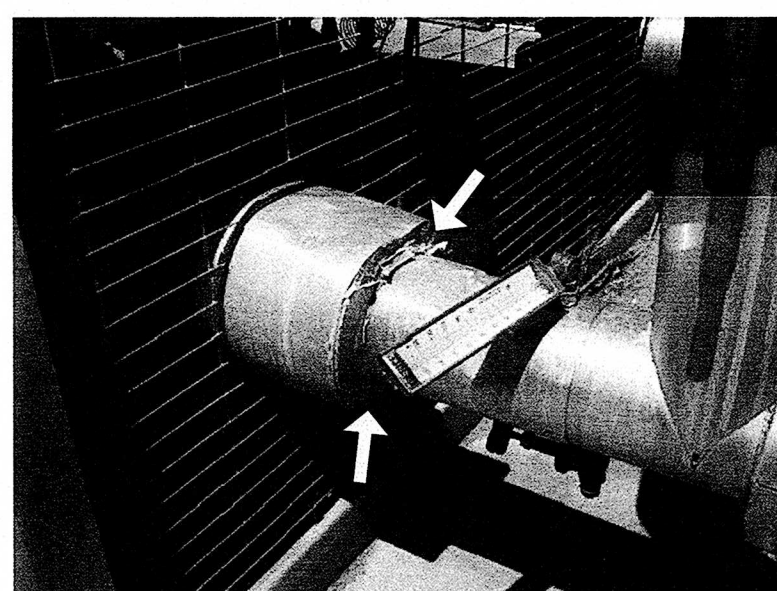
ASBESTOS-CONTAINING MUDDED JOINT PACKING LOCATED ON CHILLER PIPING ENDS TO BE REMOVED
